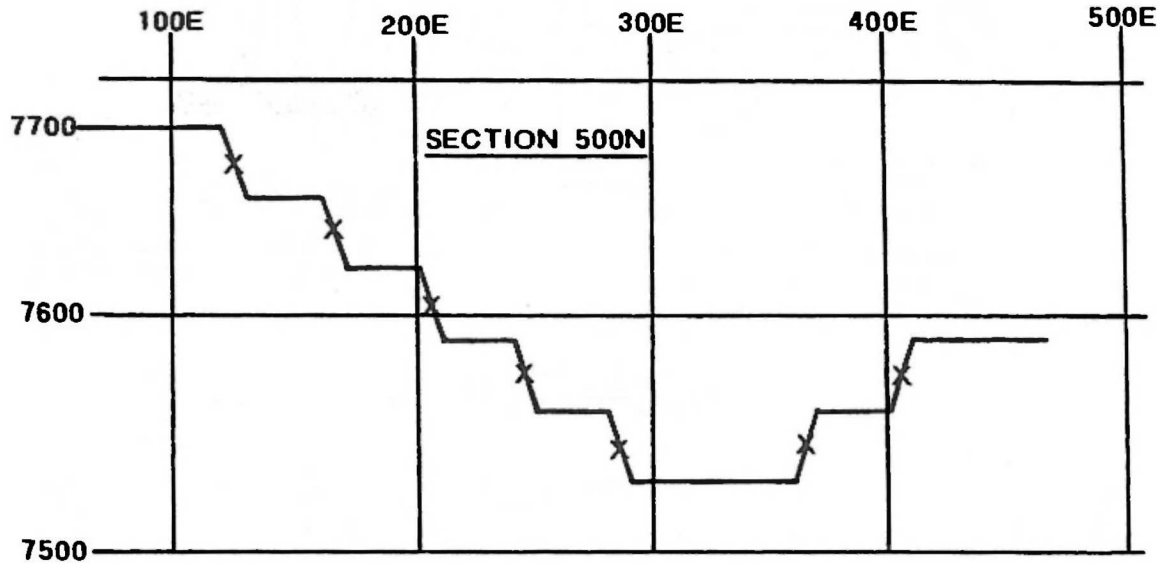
Procedure of denoting the median midbench elevation line on the bench face.
